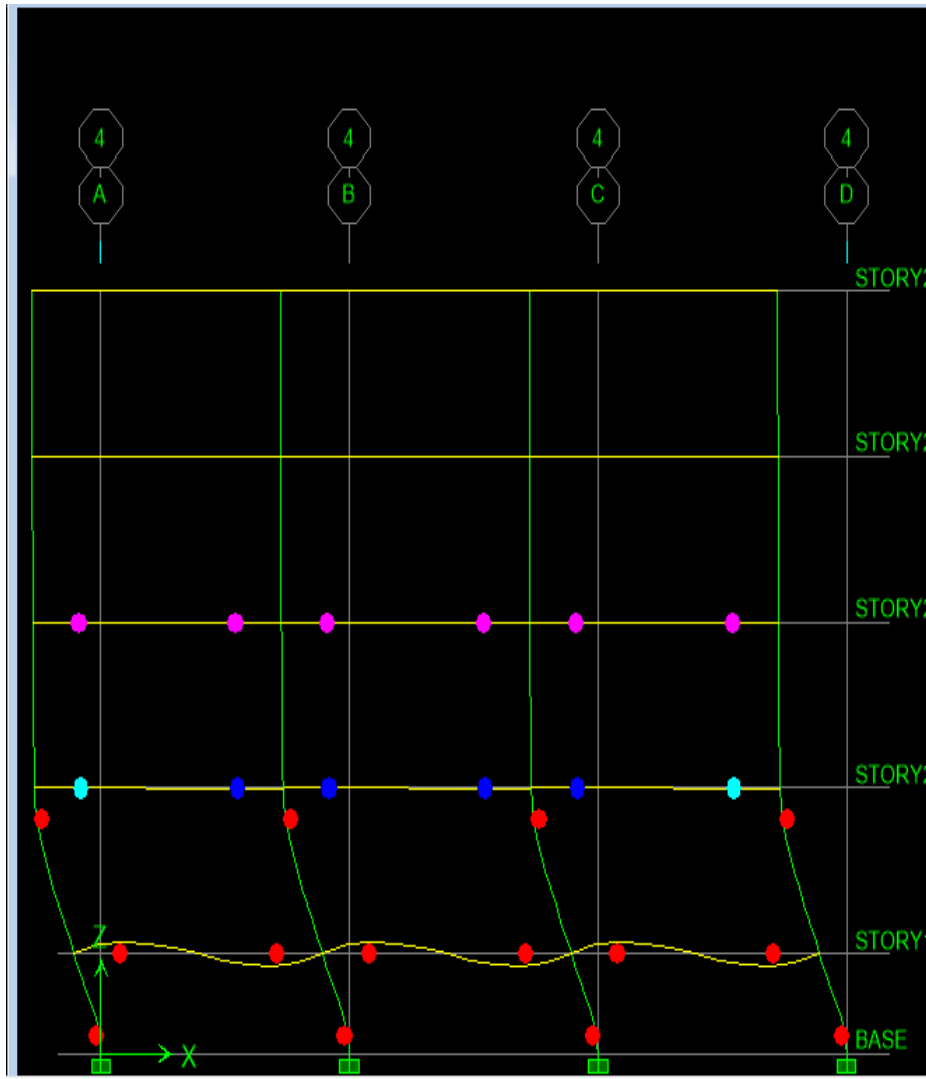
Deformation Shape of 4 Storied RCC Building in zone-0.075
